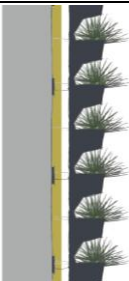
Living Wall Systems (LWS) modular system and wall mounting (created by the author).
